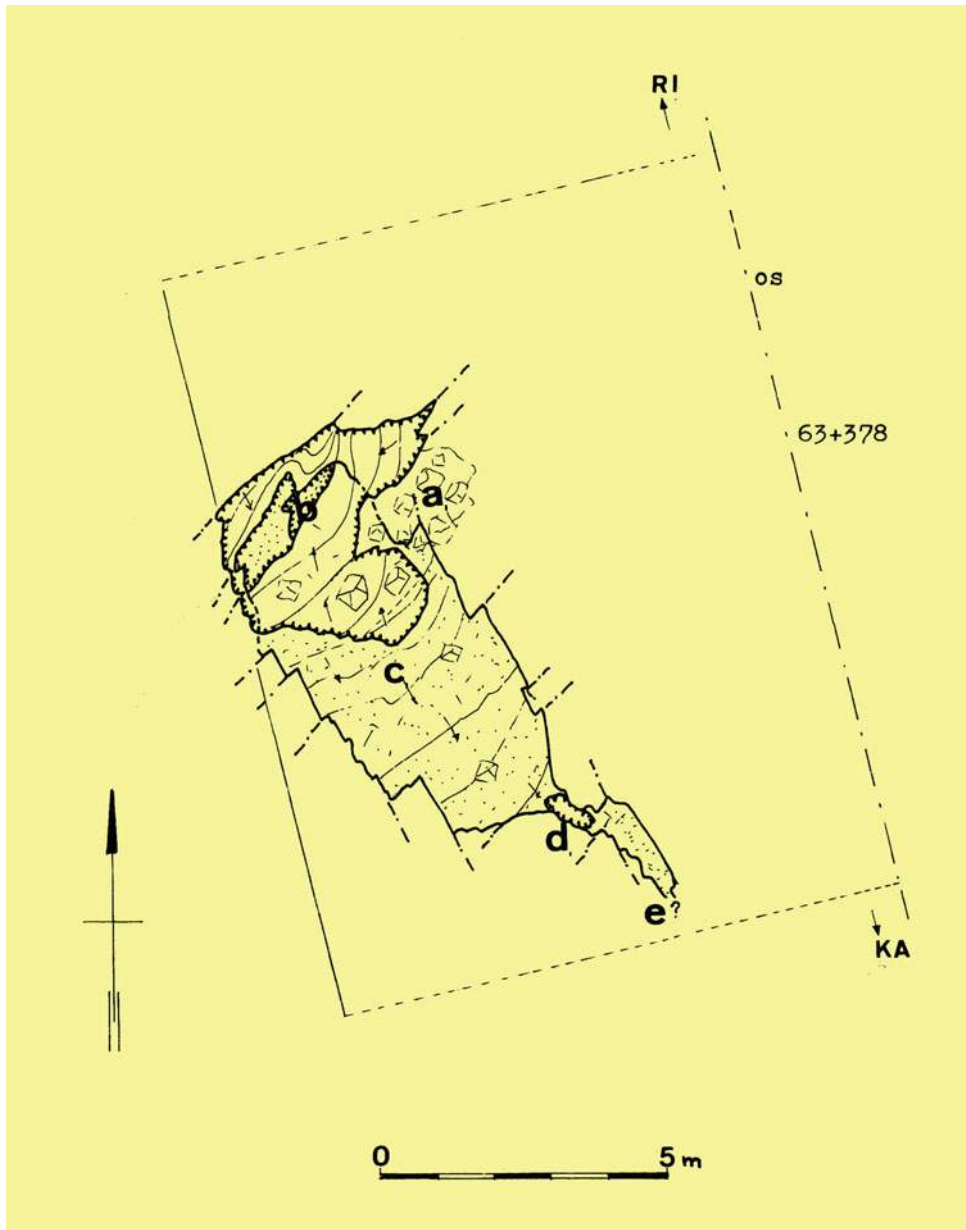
Plan of cavern at km 63 + 378 on A-6 highway, Kupjak—Vrbovsko section
